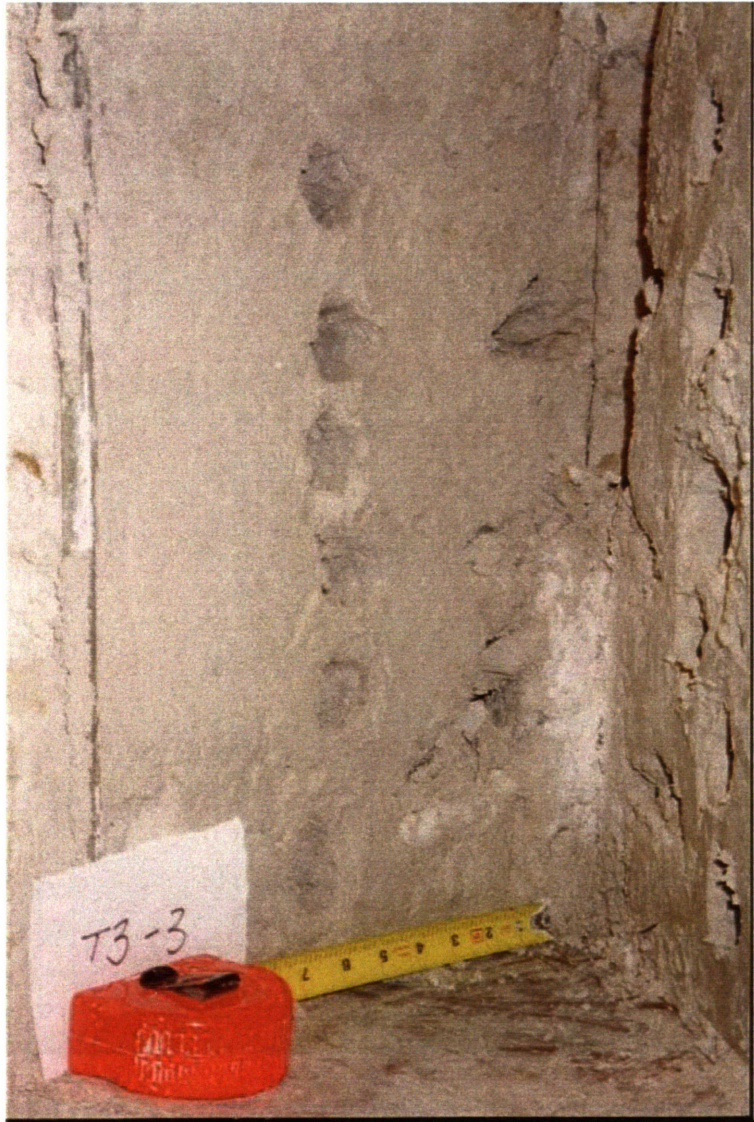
(b). View of exposed vertical soil face (Specimen T3, Section 3)
